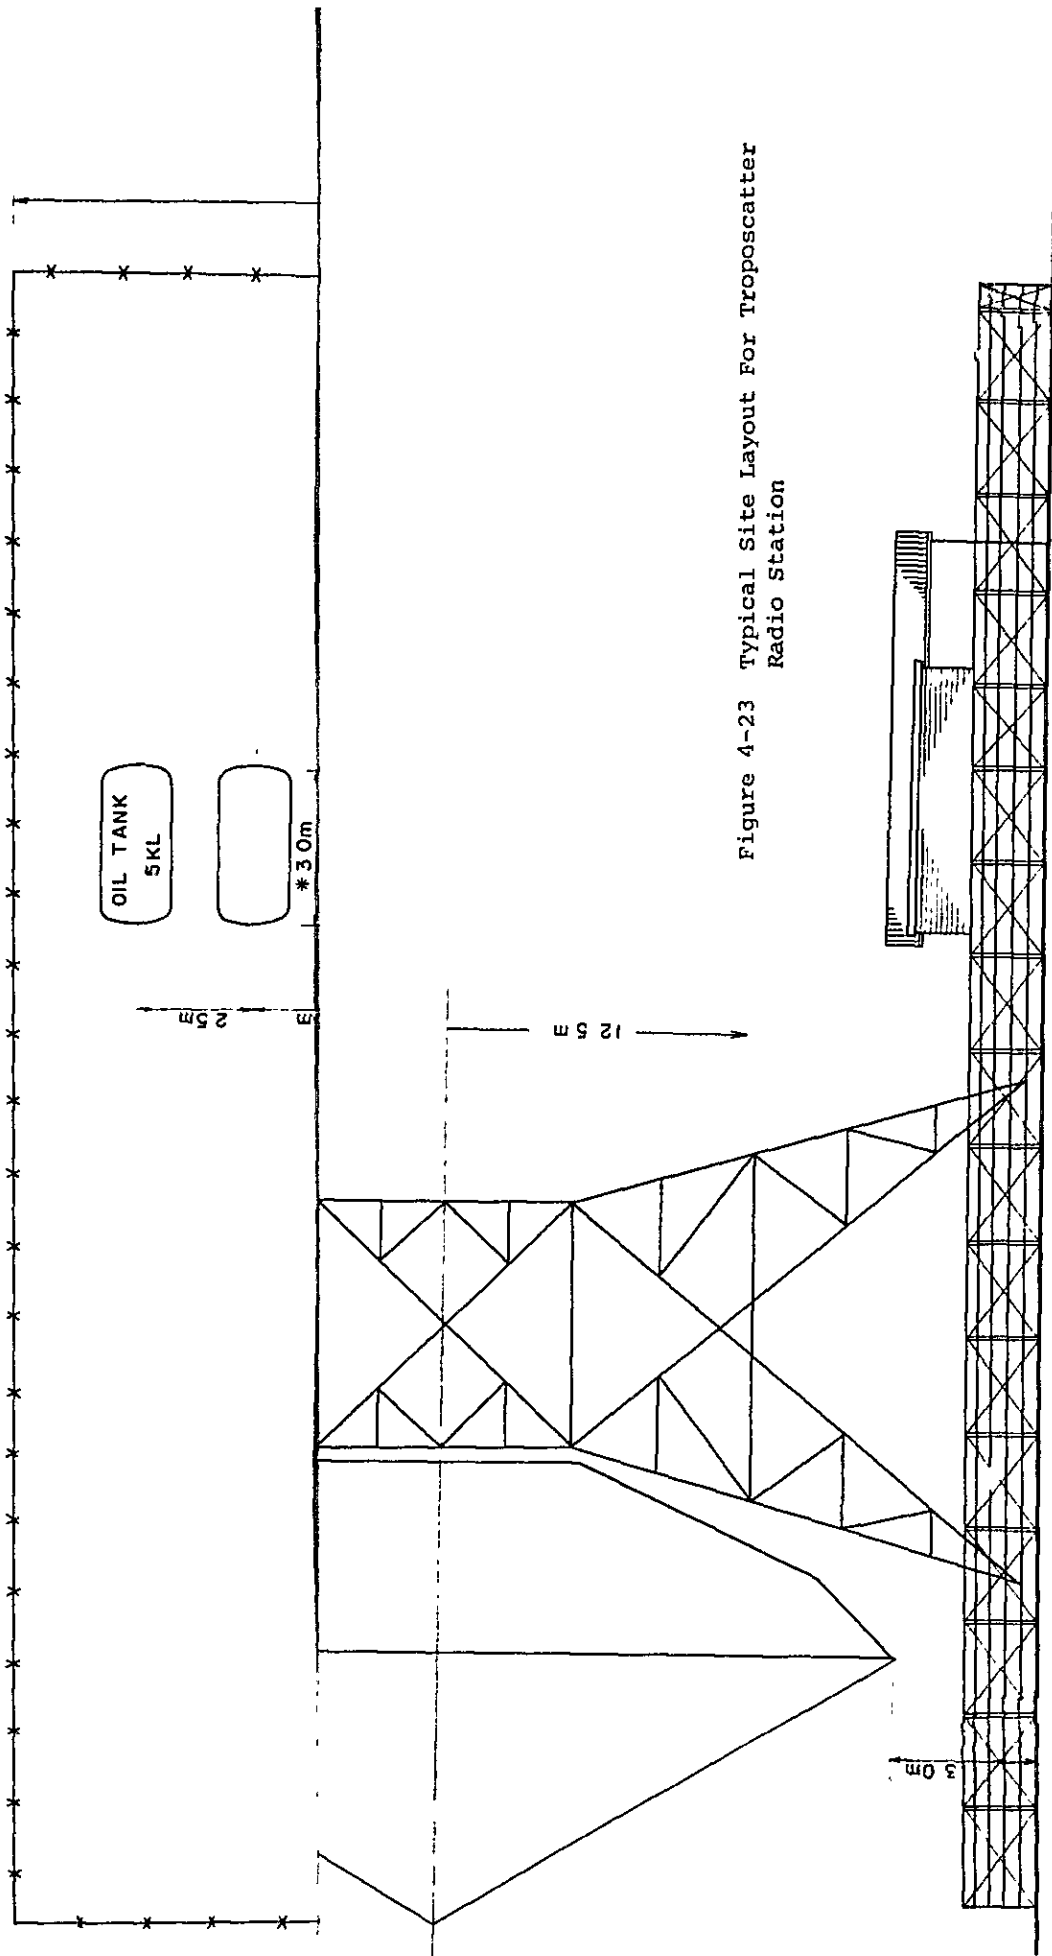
Typical Site Layout For Troposcatter Radio Station
